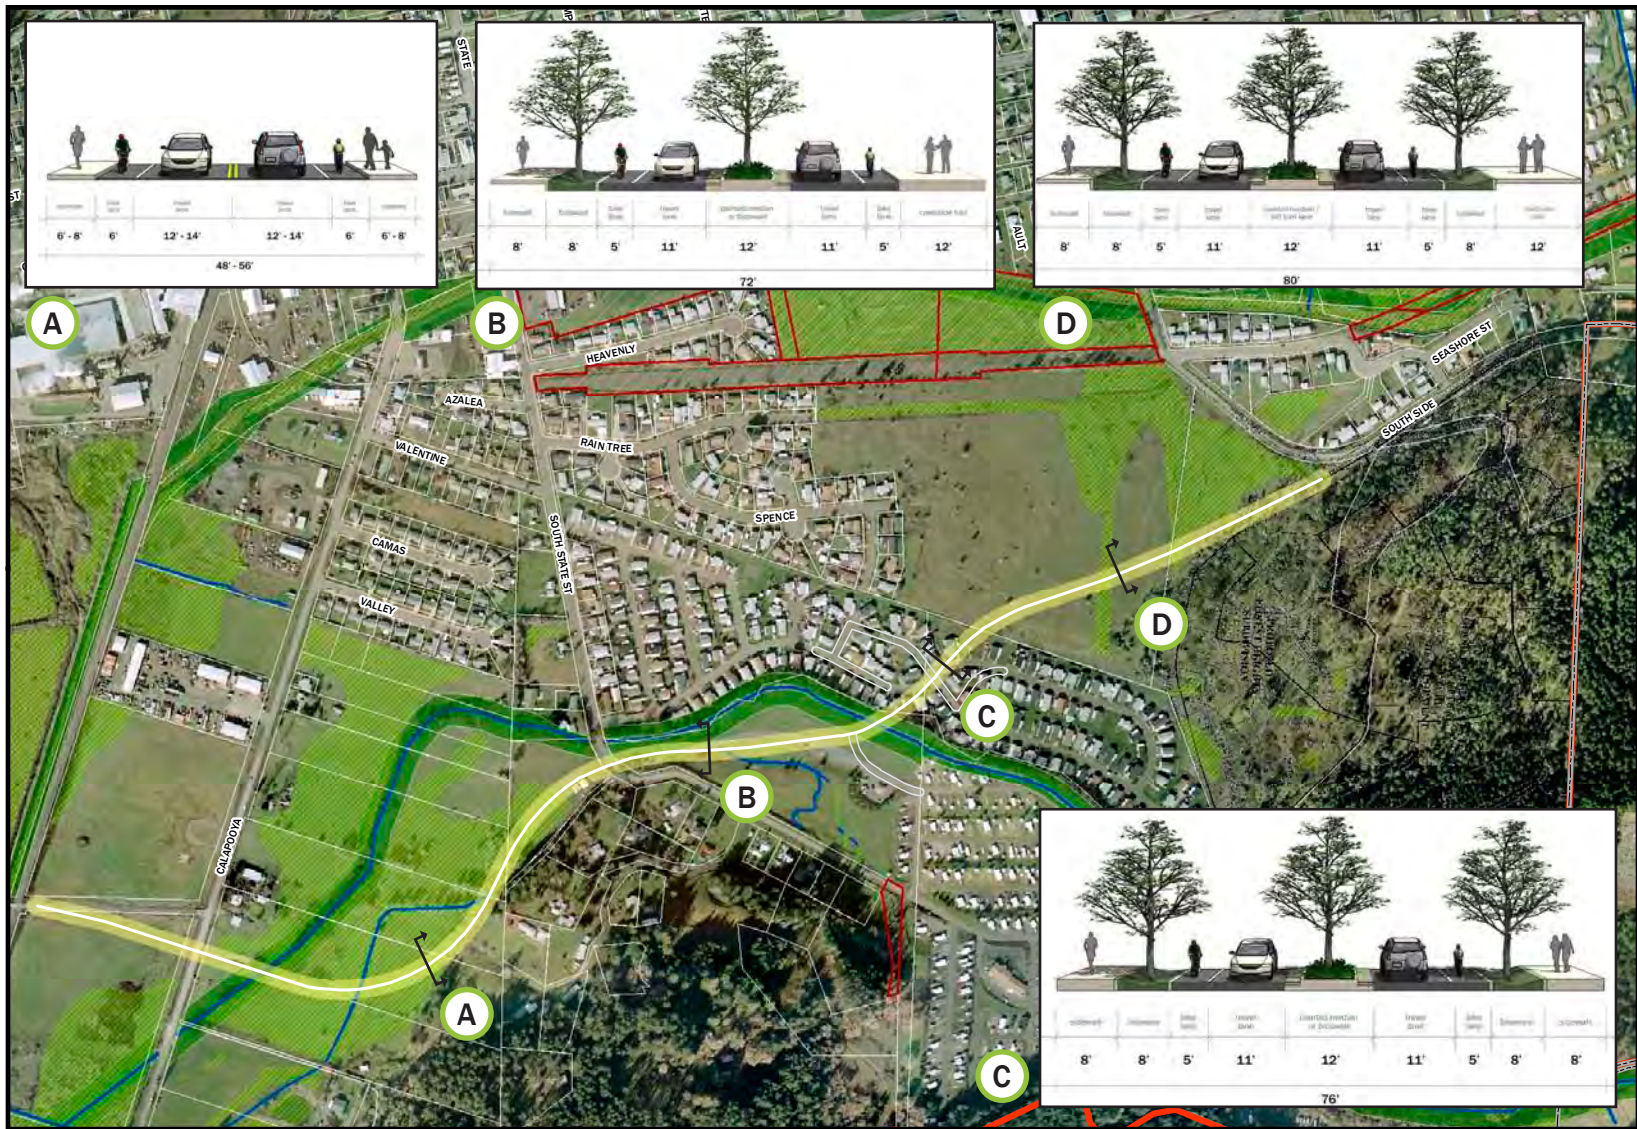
B. Potential Local Street Modifications - Parkway Alignment 2
